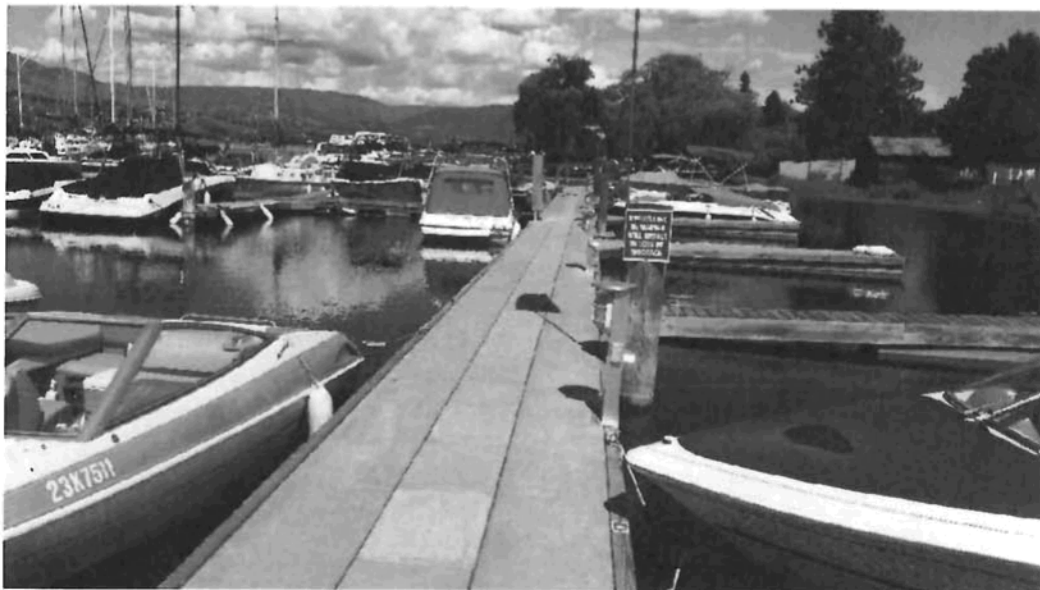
A mix of concrete a wooden docks currently occupy the marina. All upgrades will be concrete.
